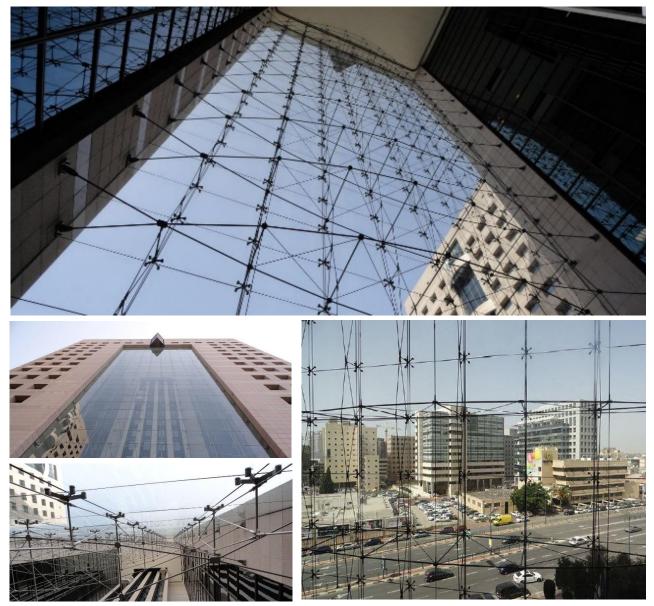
The glass facade supported with by steel cable structure. Source: http://www.octatube.nl/projecten/32/oz-building/
